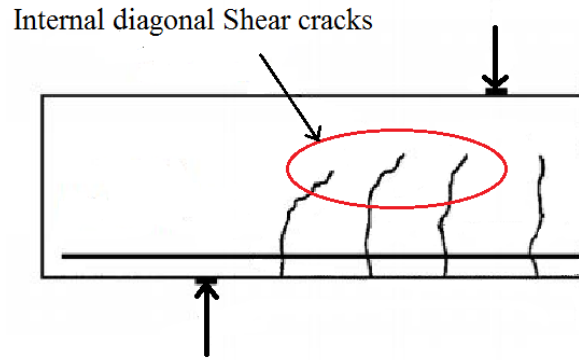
The diagonal shear cracks in beam under external loads (Davies and Neal 2014)
